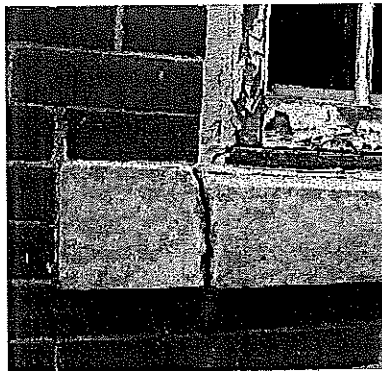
South face of Chapel showing cracked Tyndall Stone sills on two windows
